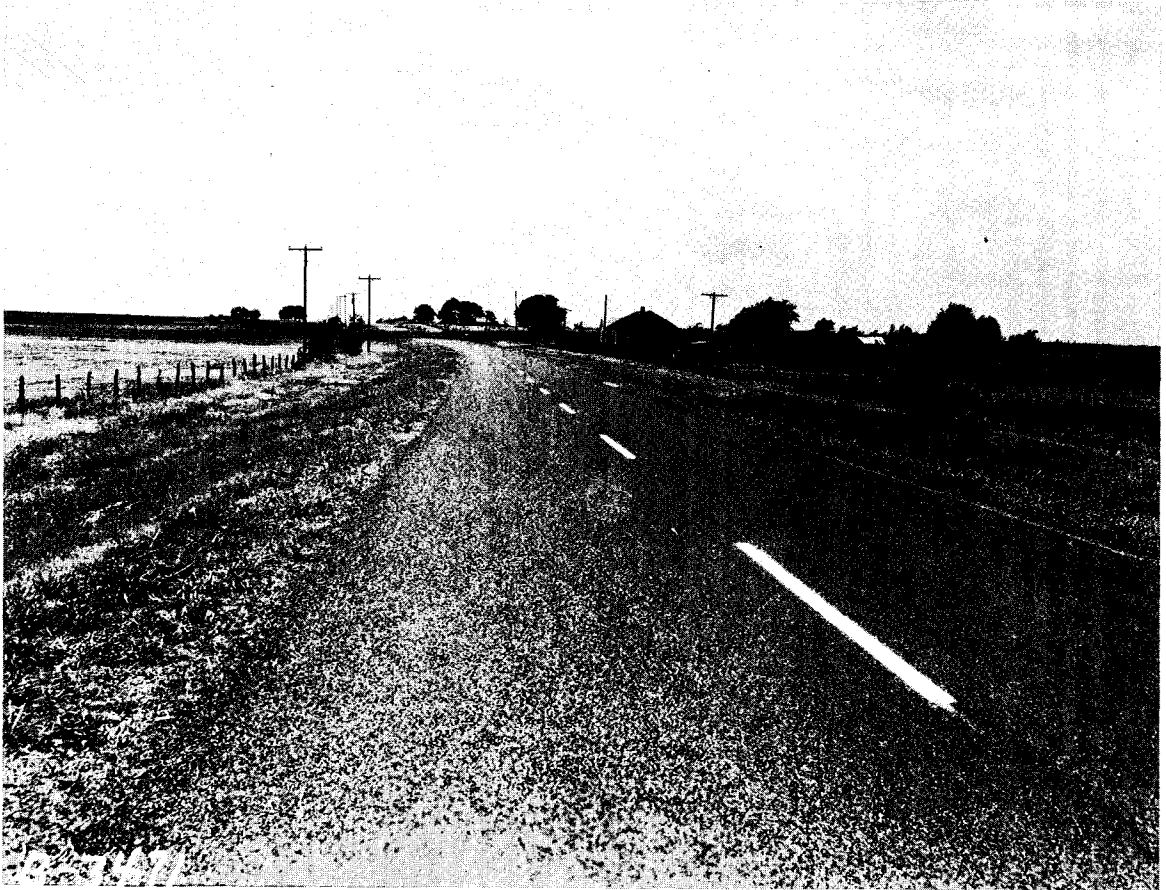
Typical form-to-market road surfaced with Type F material. (Photo by Gustafson.)
